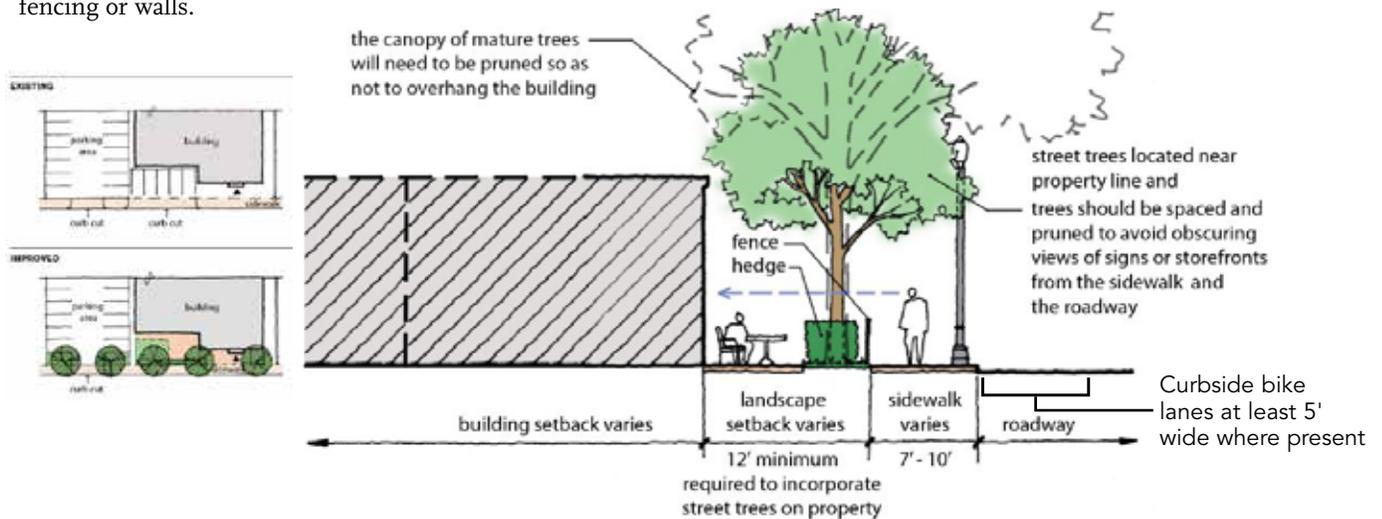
This diagram shows how a site with a shallow existing setback can enhance it with additional landscape or outdoor seating to add visual interest to the sidewalk.
